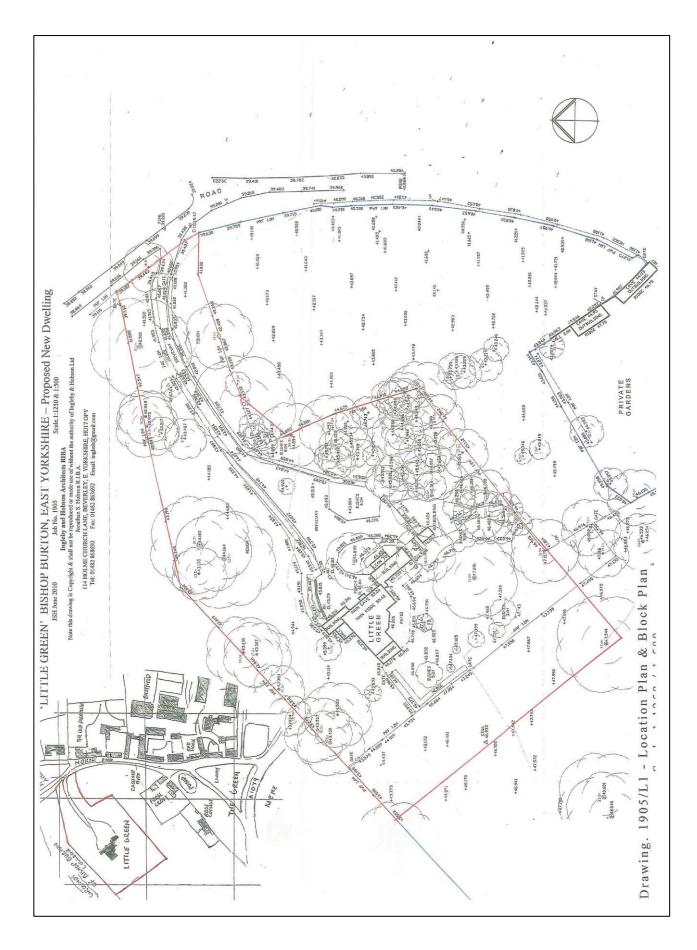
SITE LOCATION AND BLOCK PLAN (not to scale - plan supplied by Ingleby & Hobson Ltd)
